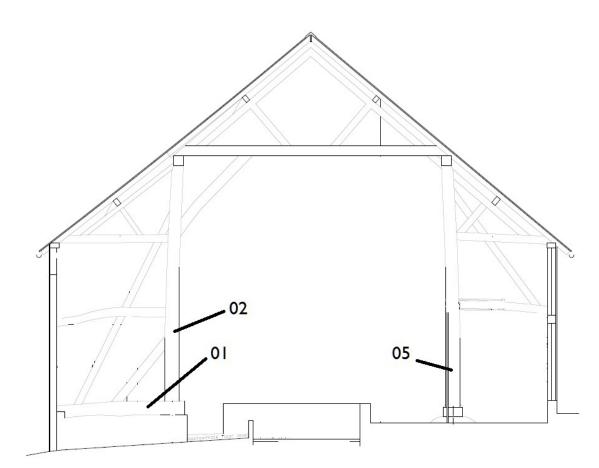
Drawing of truss B, showing typical truss form and the timbers sampled for dendrochronology. Adapted from an original drawing by Freeland Rees Roberts, Architects
